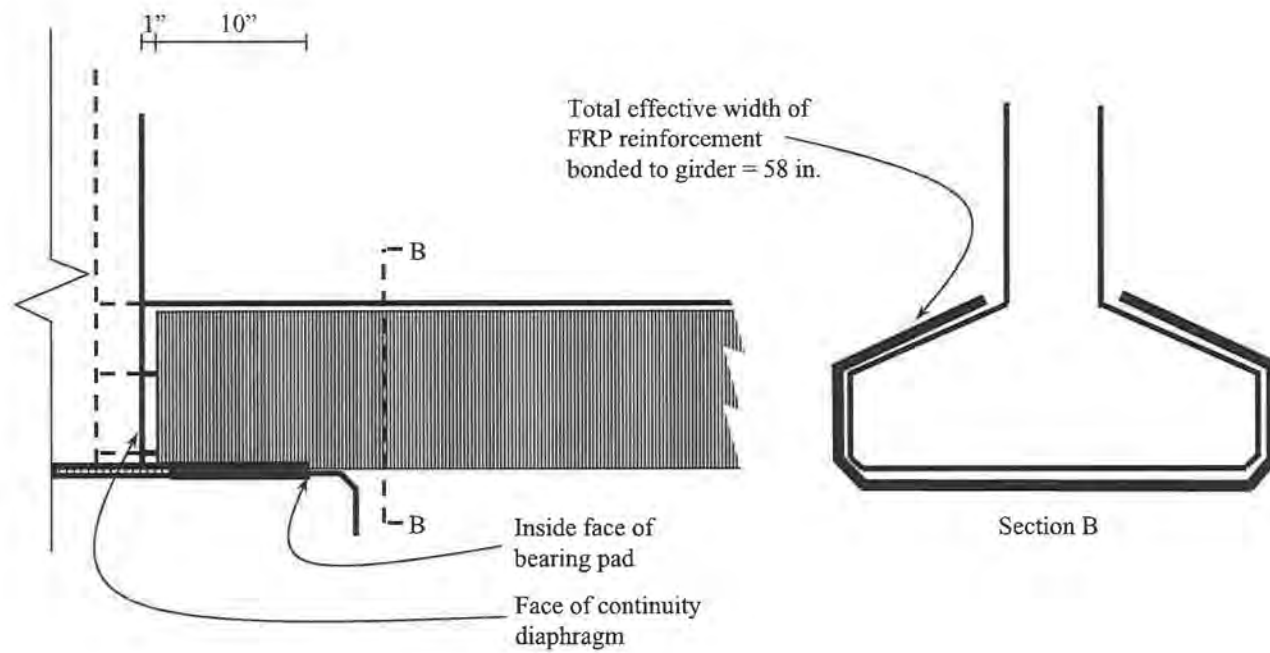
Detail of Cross-sectional FRP Configuration for Cross Sections in the Clear Span of the Bulb-tee Girder
